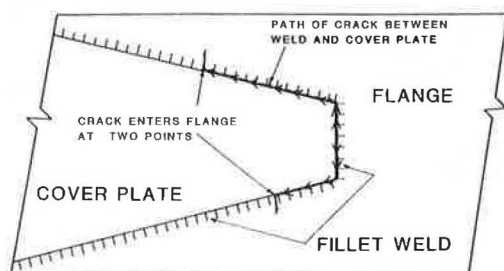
Cross section of flange showing two fatigue cracks.
